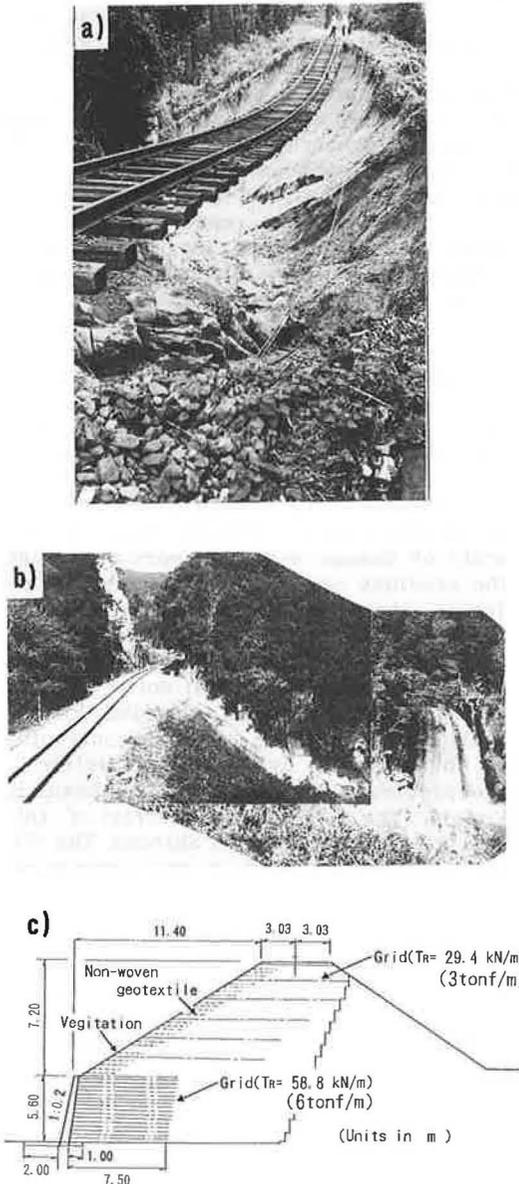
a) View after damage, and b) view and c) typical cross-section of reconstructed embankment at Hyokiyama/Hinatayama site, damaged and reconstructed in 1993, the Hisatsu Line (No. 35 in Fig. 3)
